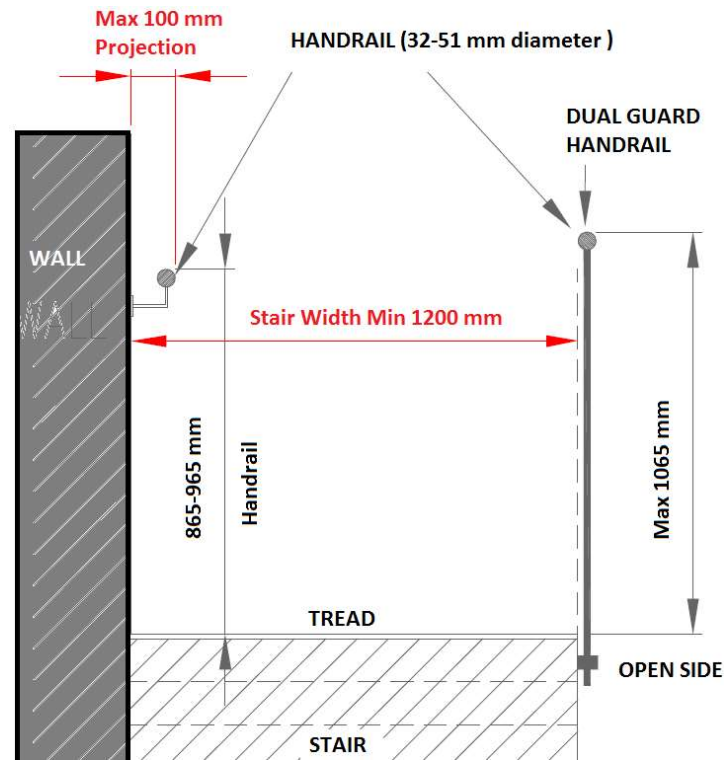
a.: Handrail projection, Stair Width Measurements
